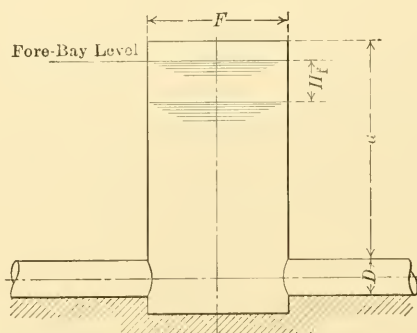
MINIMUM DIMENSIONS OF A STANDPIPE
